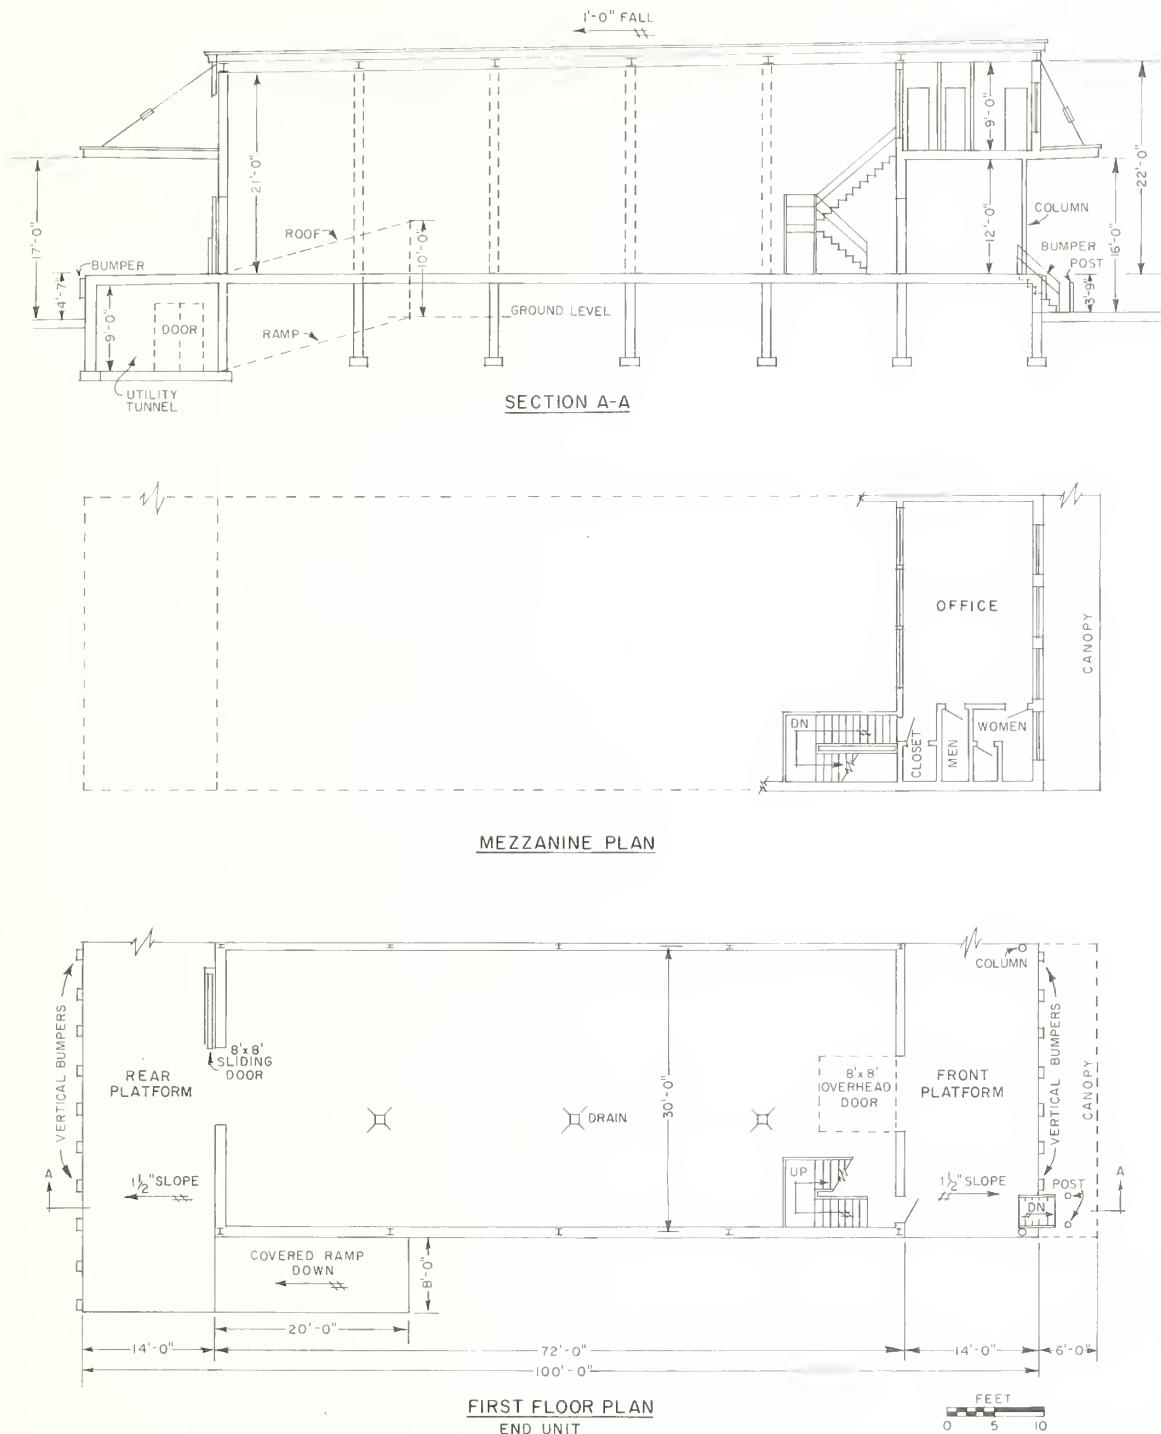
Layout of a butter, margarine, cheese, and egg unit in a multiple-occupancy building. Notes: 1. The use of a utility tunnel is optional. Without the tunnel, refrigeration equipment could be located on the roof and utility lines along walls inside the building. 2. Buildings shown have support columns. Recent studies, completed during the writing of this report, indicate there would be little or no increase in cost to construct this building without support columns.
